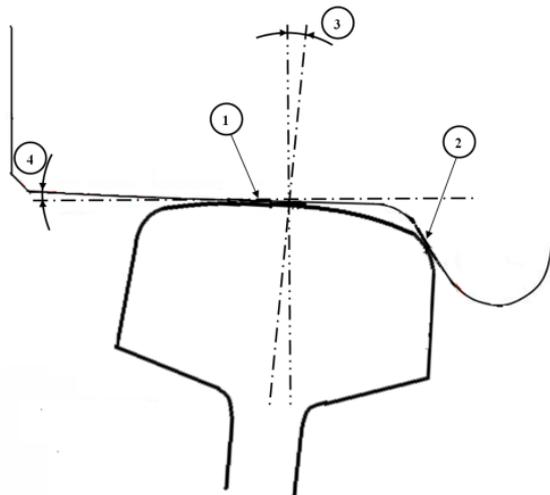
Schematic of two types of wheel–rail contact: 1. wheel tread–railhead contact and 2. wheel flange–rail gauge contact; 3. rail inclination; 4. conical wheel profile.
